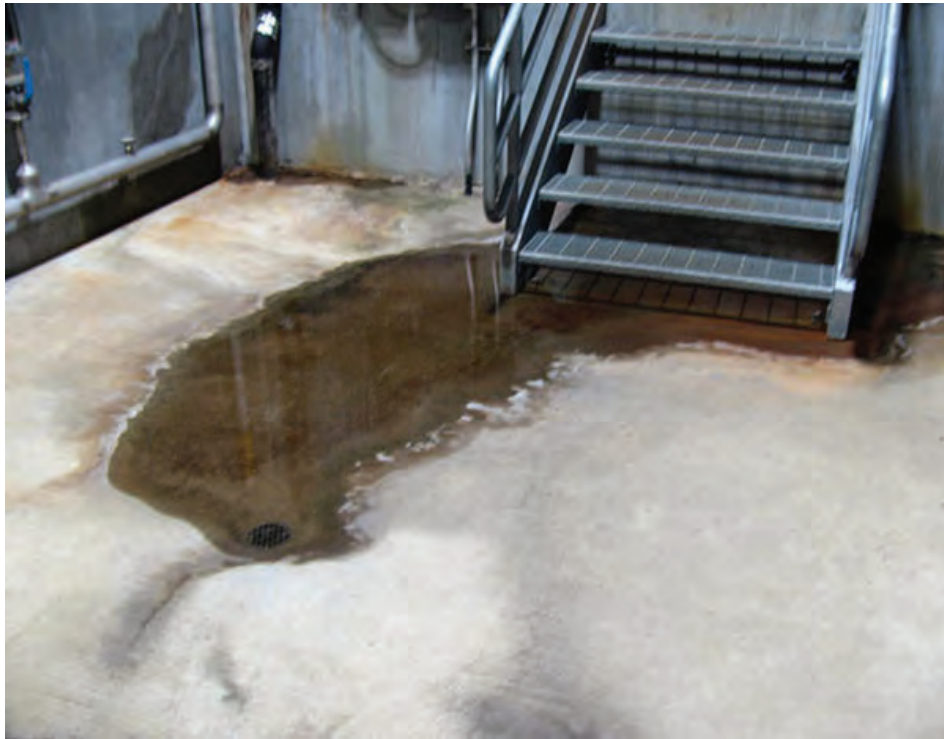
LS9 – Ponding water on the floor of the Ozone Gallery that is fed by an active leaking expansion joint.
